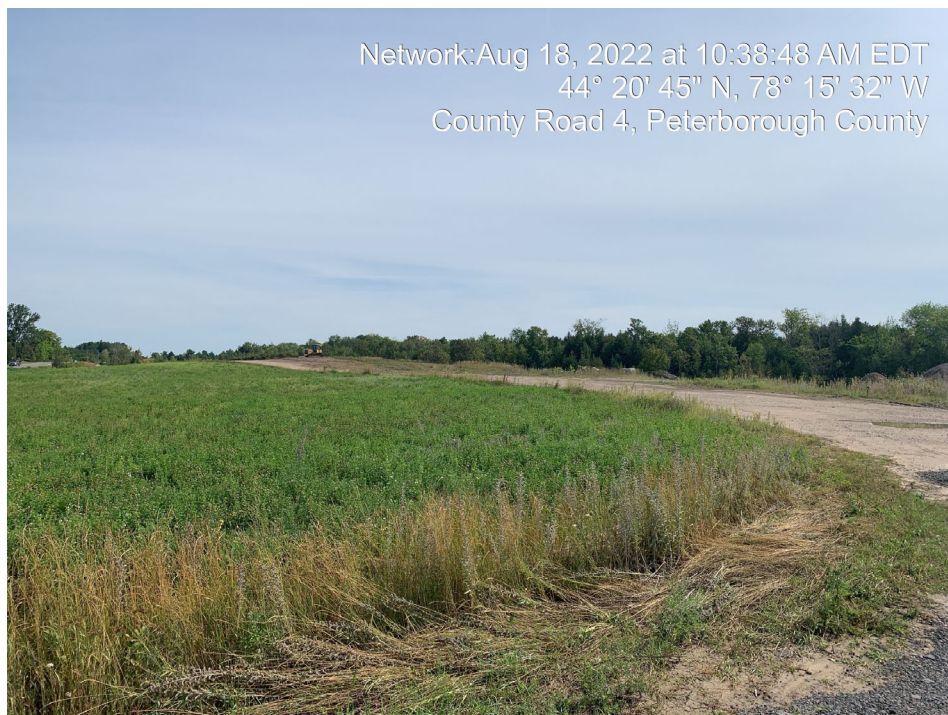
View of the Site, facing east, showing future soil filling area in background
